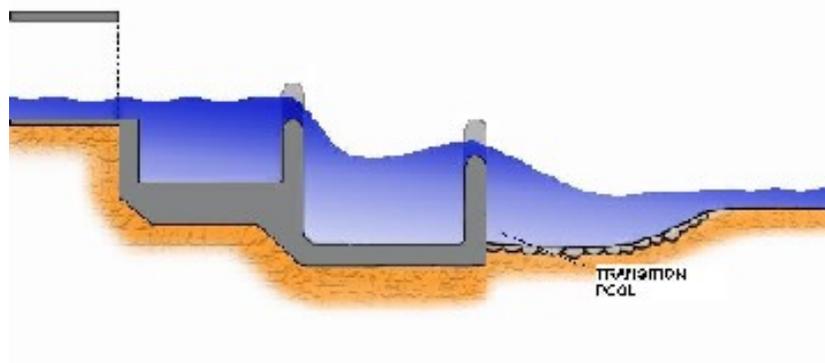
TYPICAL PLUNGE POOL INSTALLATIONS
